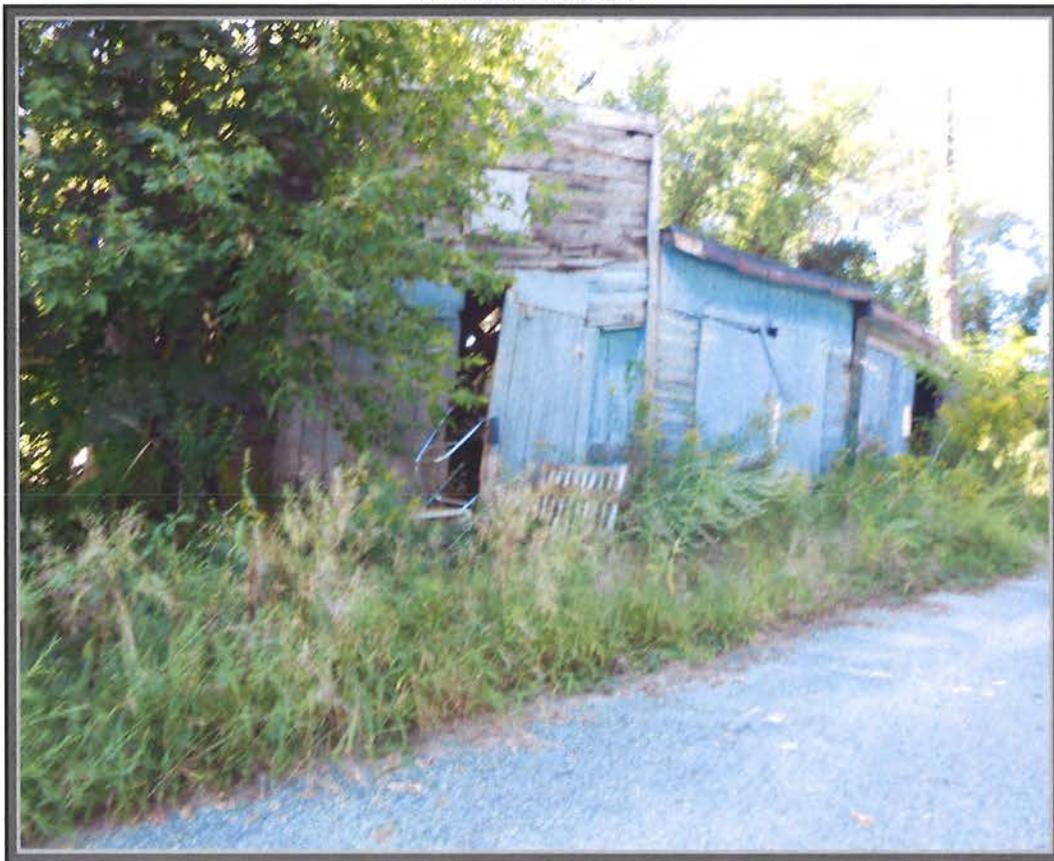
taken September 8, 2014 showing the collapsed roof of the garage.
